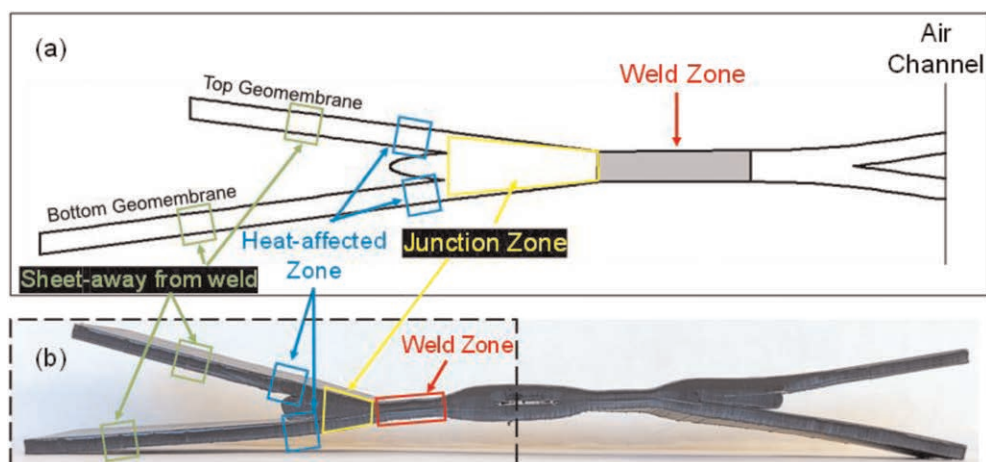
Cross-section of typical HDPE dual track fusion weld (a) Schematic magnification of main zones, (b) Entire cross-section of the weld.
